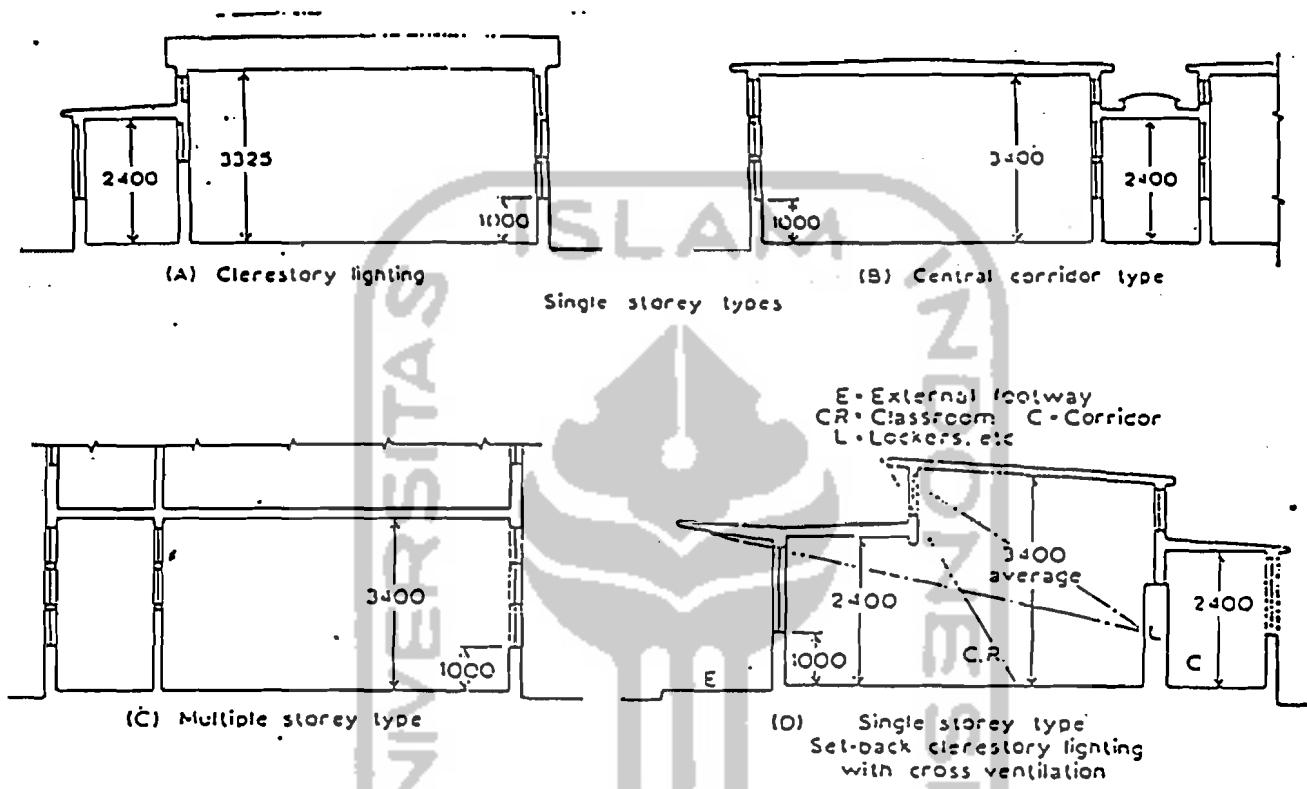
(A) to (C) Classrooms and corridors: lighting and ventilation; (D) Classroom and corridor sections
